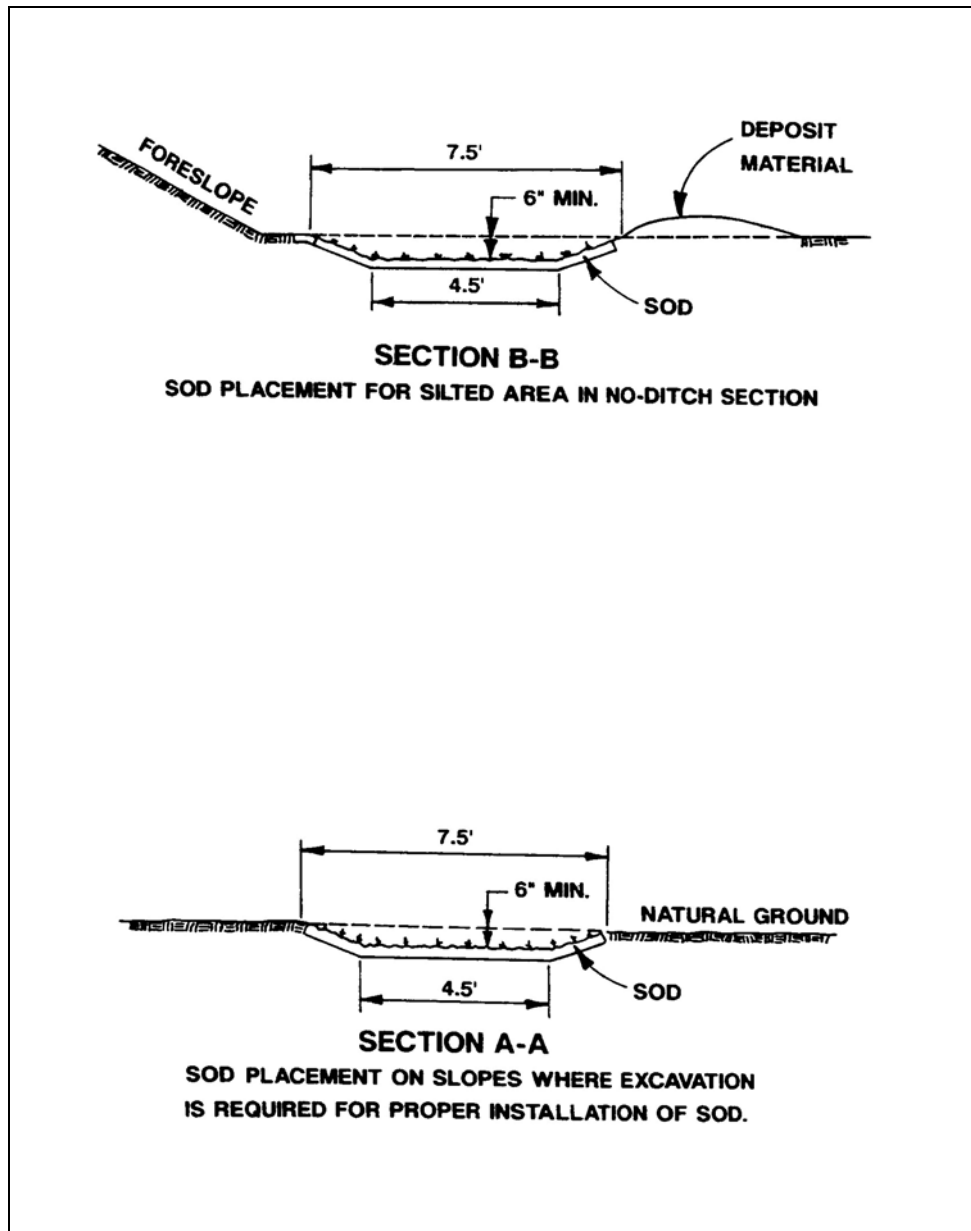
Sod placement in no-ditch and slope situations (Source: Department of Civil, Construction, and Environmental Engineering, Iowa State University)
